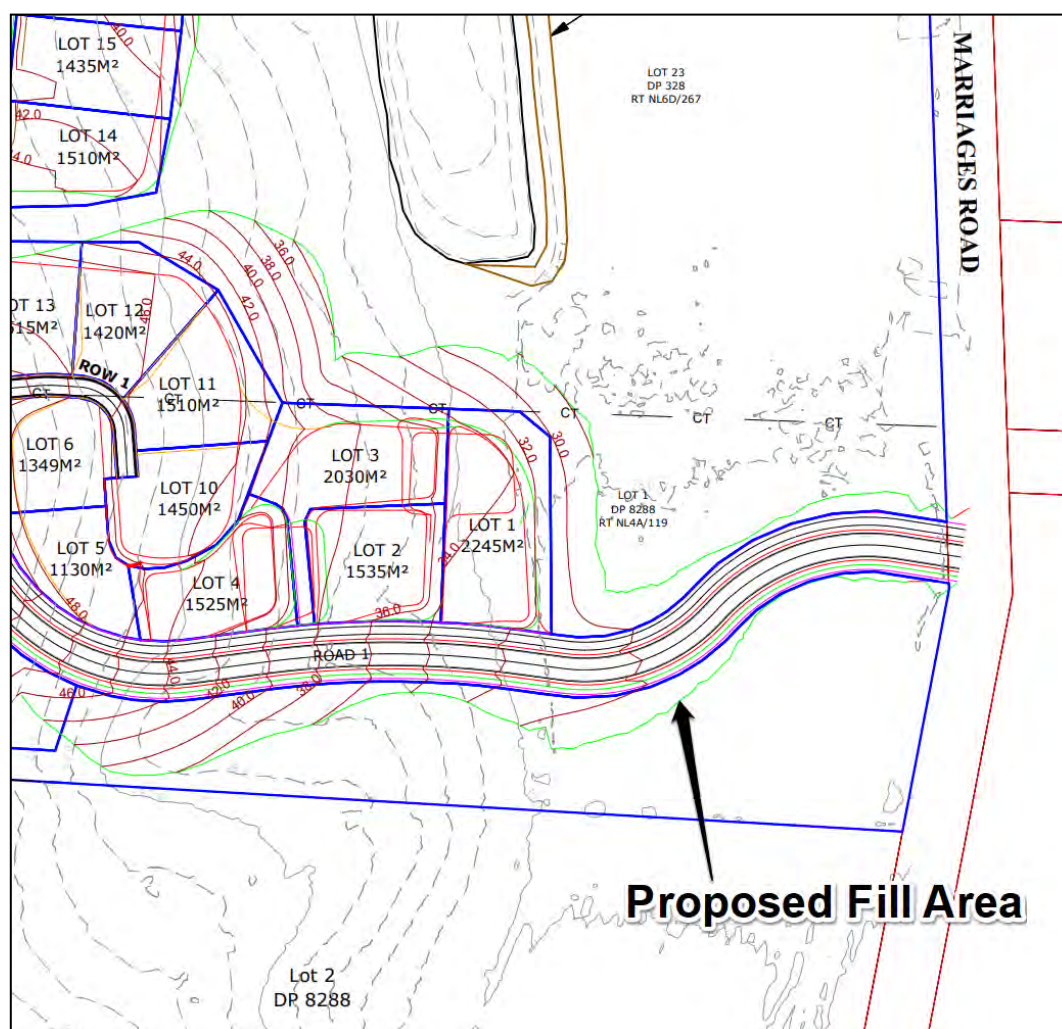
Screenshot of 11460 Plan Set by Eliot Sinclair showing proposed Road 1 and associated fill extent.
